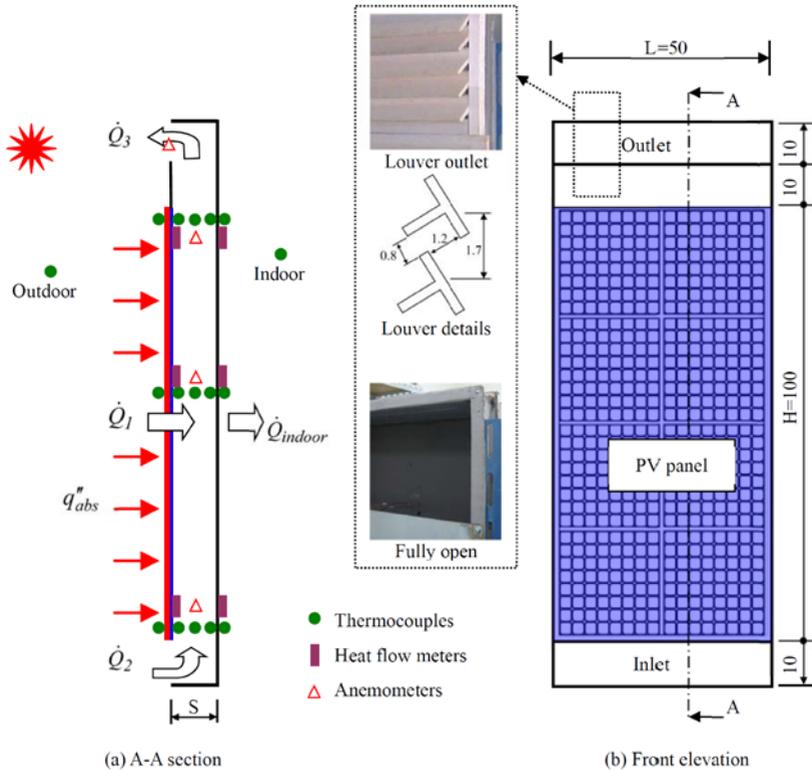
The tested ventilated BIPV curtain walls and measurement locations (unit: cm)
